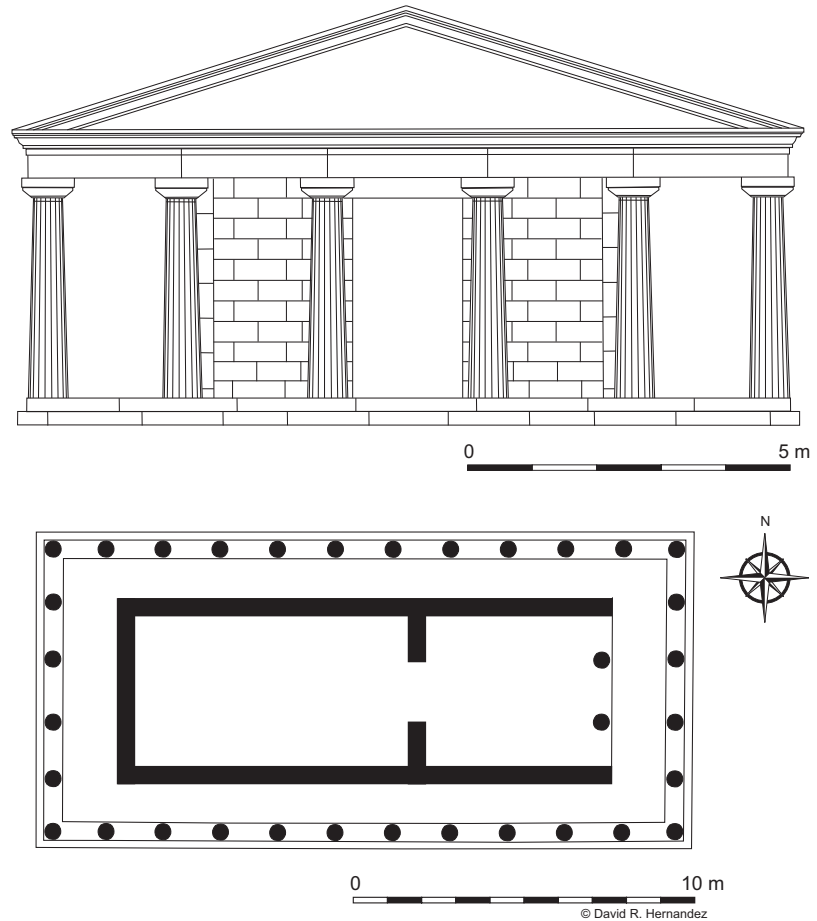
Reconstructed elevation and plan of the Kardaki temple, Korkyra. D. Hernandez
